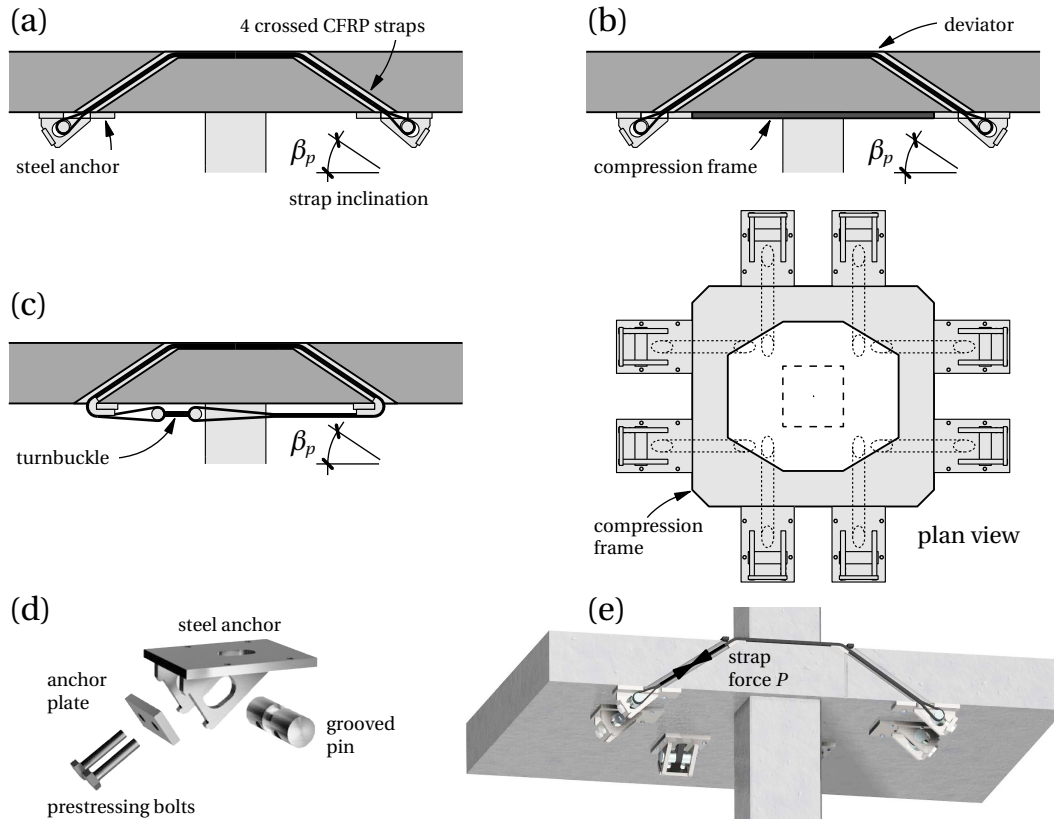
Strengthening concept: (a): open strap configuration with adhesively-bonded anchors, (b) with steel compression frame, (c) closed strap configuration, (d) anchor detail, (e) bottom view with adhesively-bonded anchors
